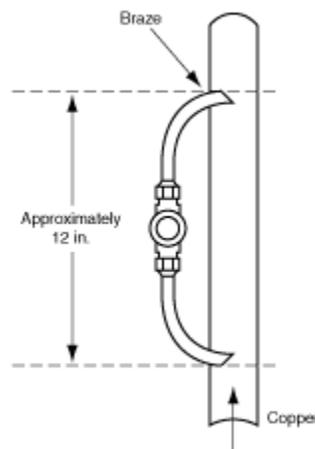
F19B Sight glass connections for large copper tube and steel pipe lines.
